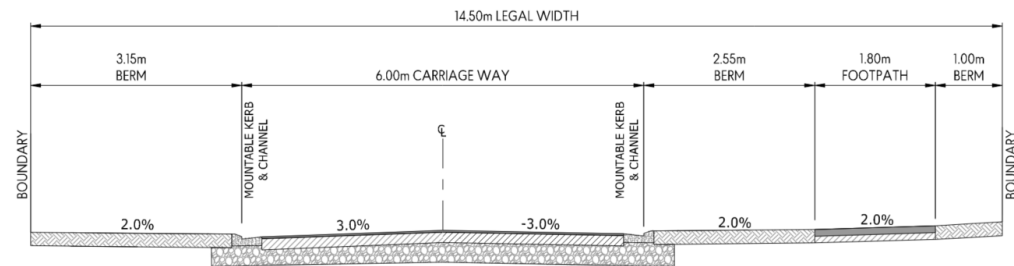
Typical Cross-Section (H) Local Road - 14.5m With Berm
